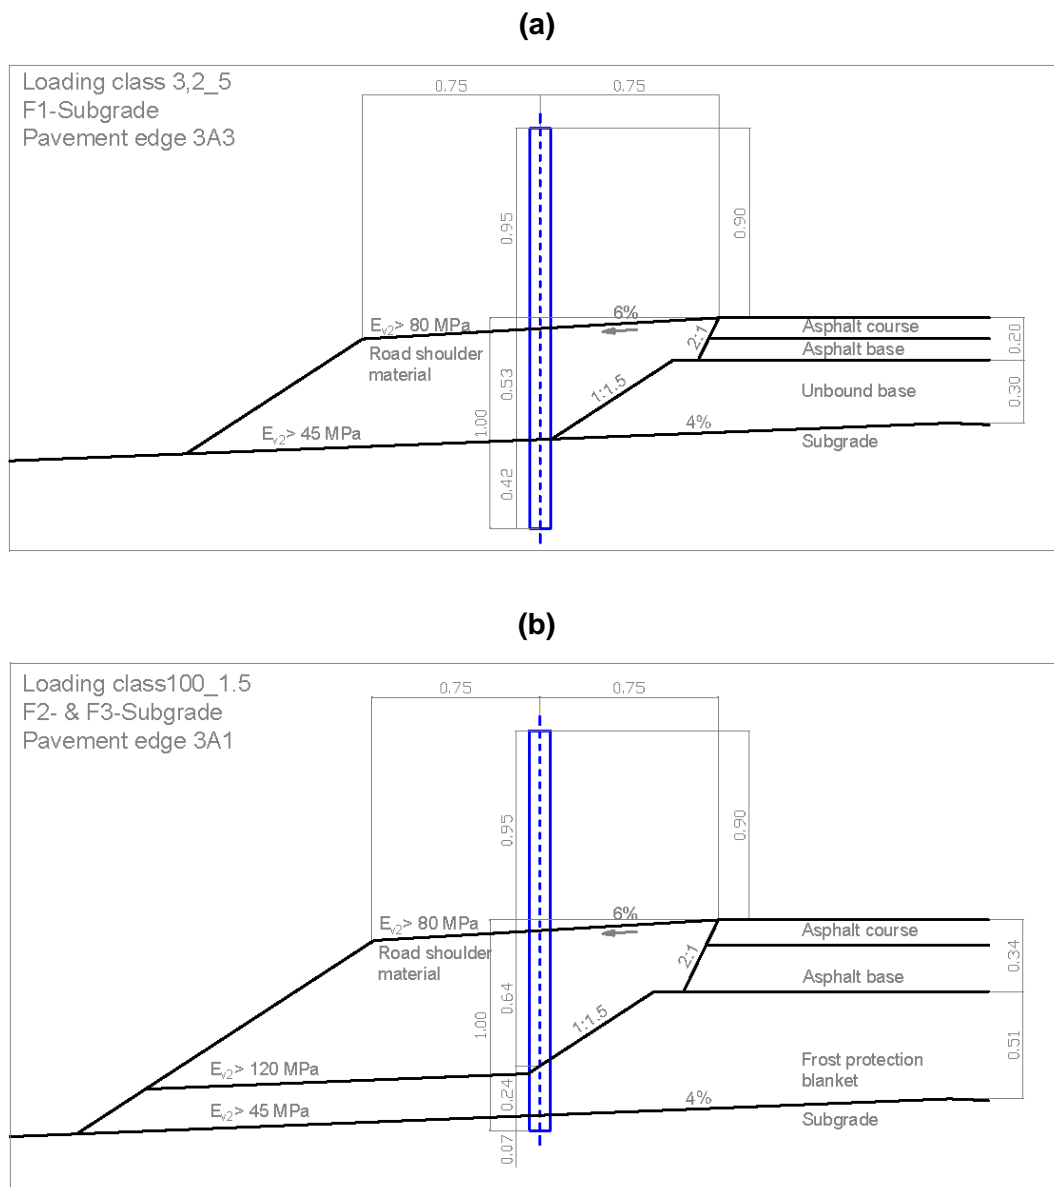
Variation of the road construction layers in the road shoulder with respect to the post embedment
